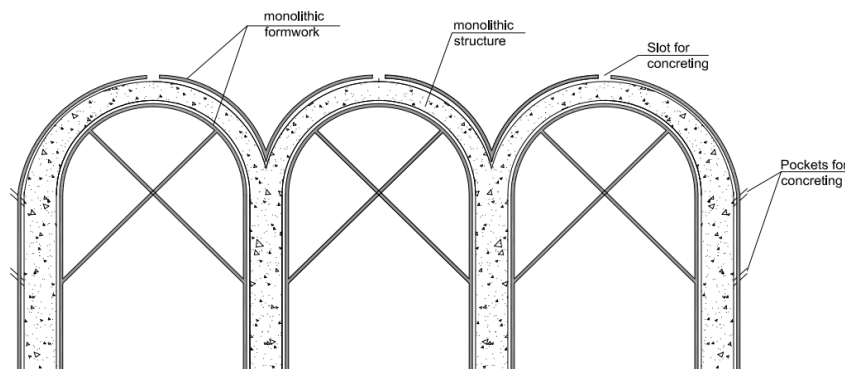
Cross section of the monolithic formwork with slots and concreting pockets
